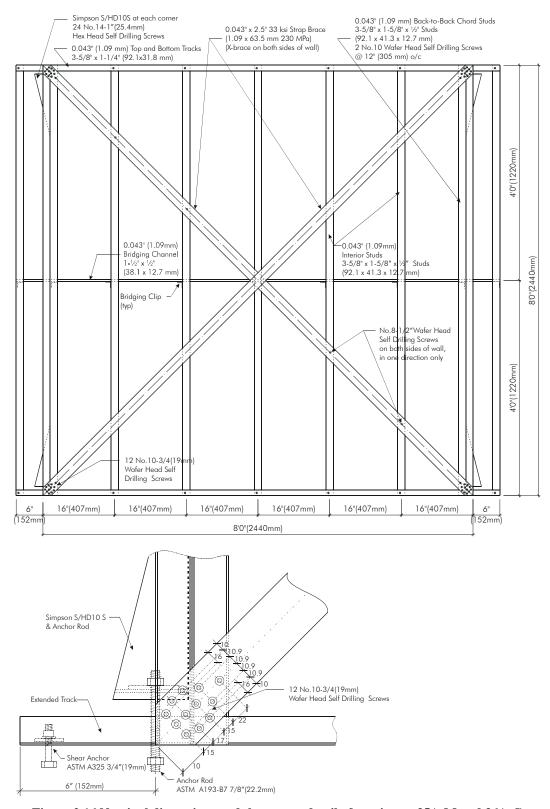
Nominal dimensions and the corner detail of specimens 35A-M and 36A-C
